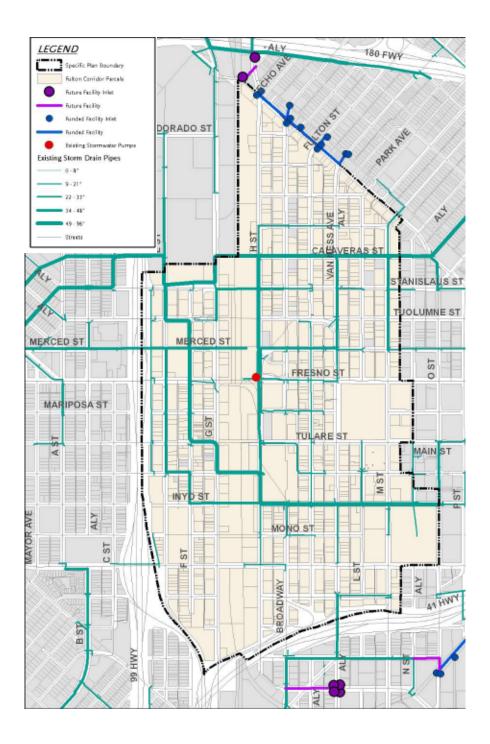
Existing Downtown Storm Drain System-Specific Plan Area
